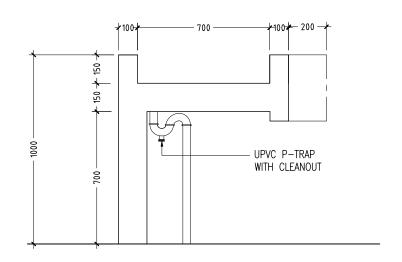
DETAIL J- FISH FILLETING PLATFORM SECTION SCALE 1:20
